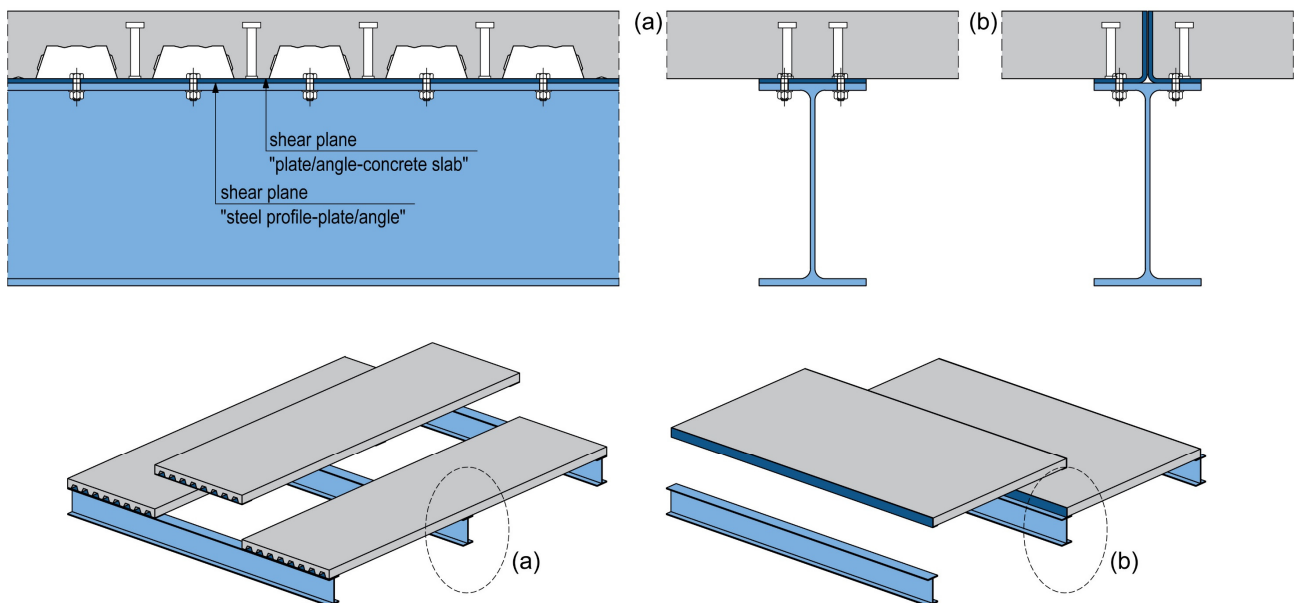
Layout of the demountable connection with welded headed studs and bolts: (a) continuous slab over the beam, (b) discontinuous slab over the beam.
